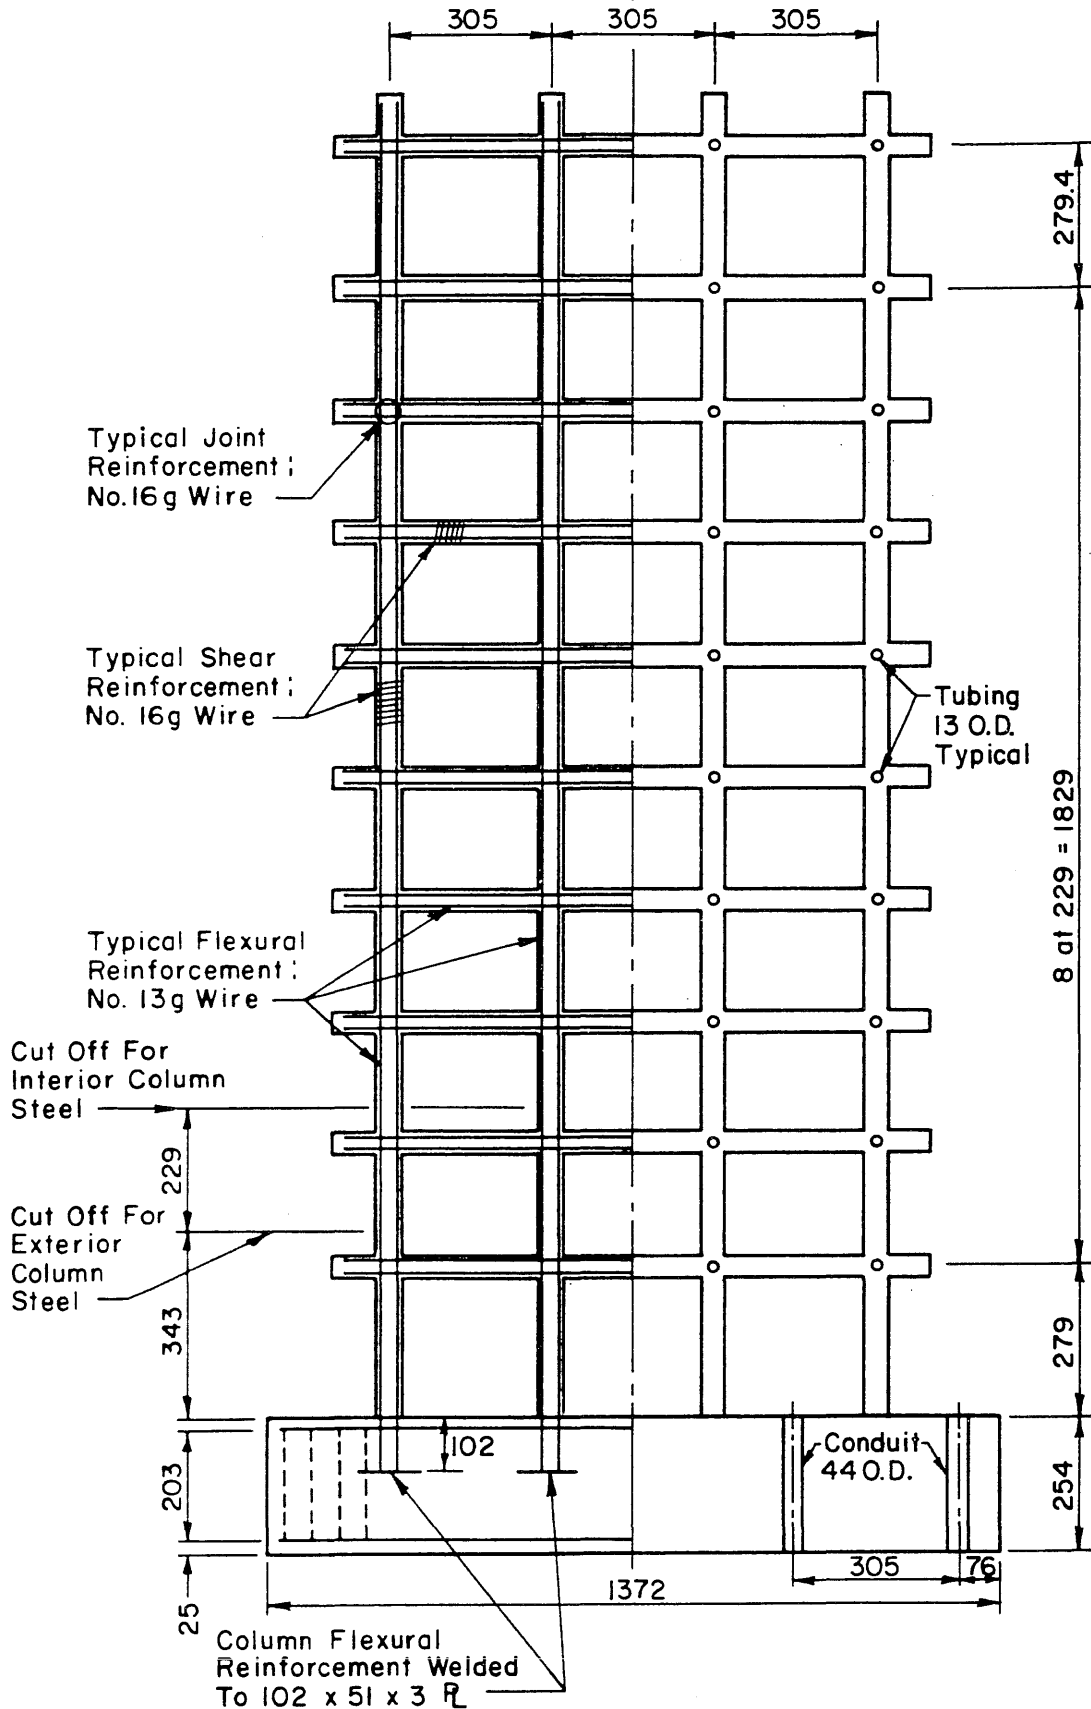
Reinforcement Detail and Dimensions of the Test Structure
